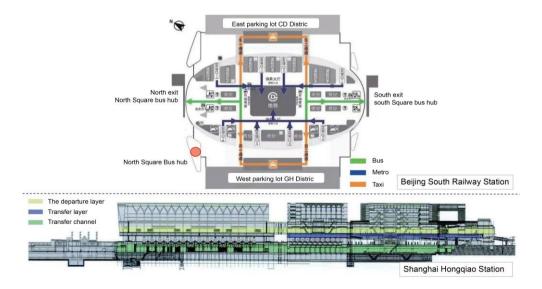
Space Structure of Beijing South Railway Station and Shanghai Hongqiao Railway Station
